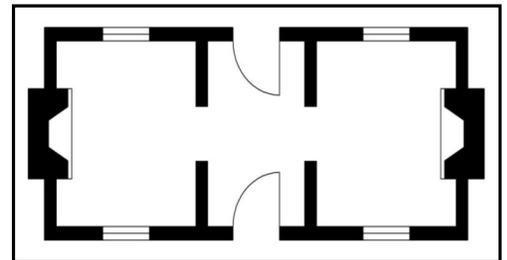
Example of a Central Hall Floor Plan (image from *House Types in Georgia*)
